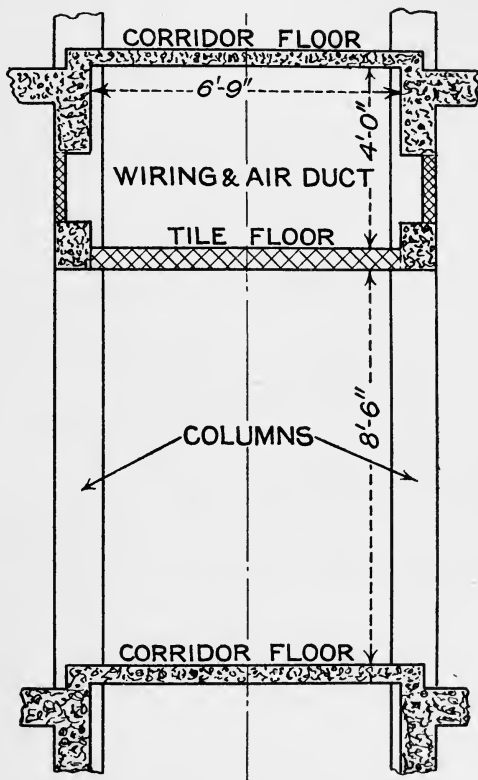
DETAILS OF DUCT CONSTRUCTION
